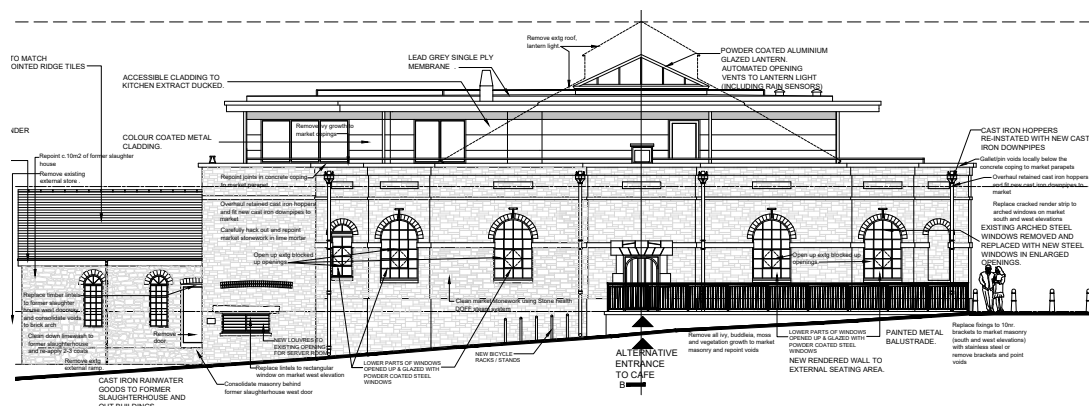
above: Proposed north west elevation - source Pembroke Design Ltd illustrating repositioning of louvre, opening up of additional blind recesses, additional window and door to roof top extension, repositioning of roof top vent, slate finish to slaughter house roof
